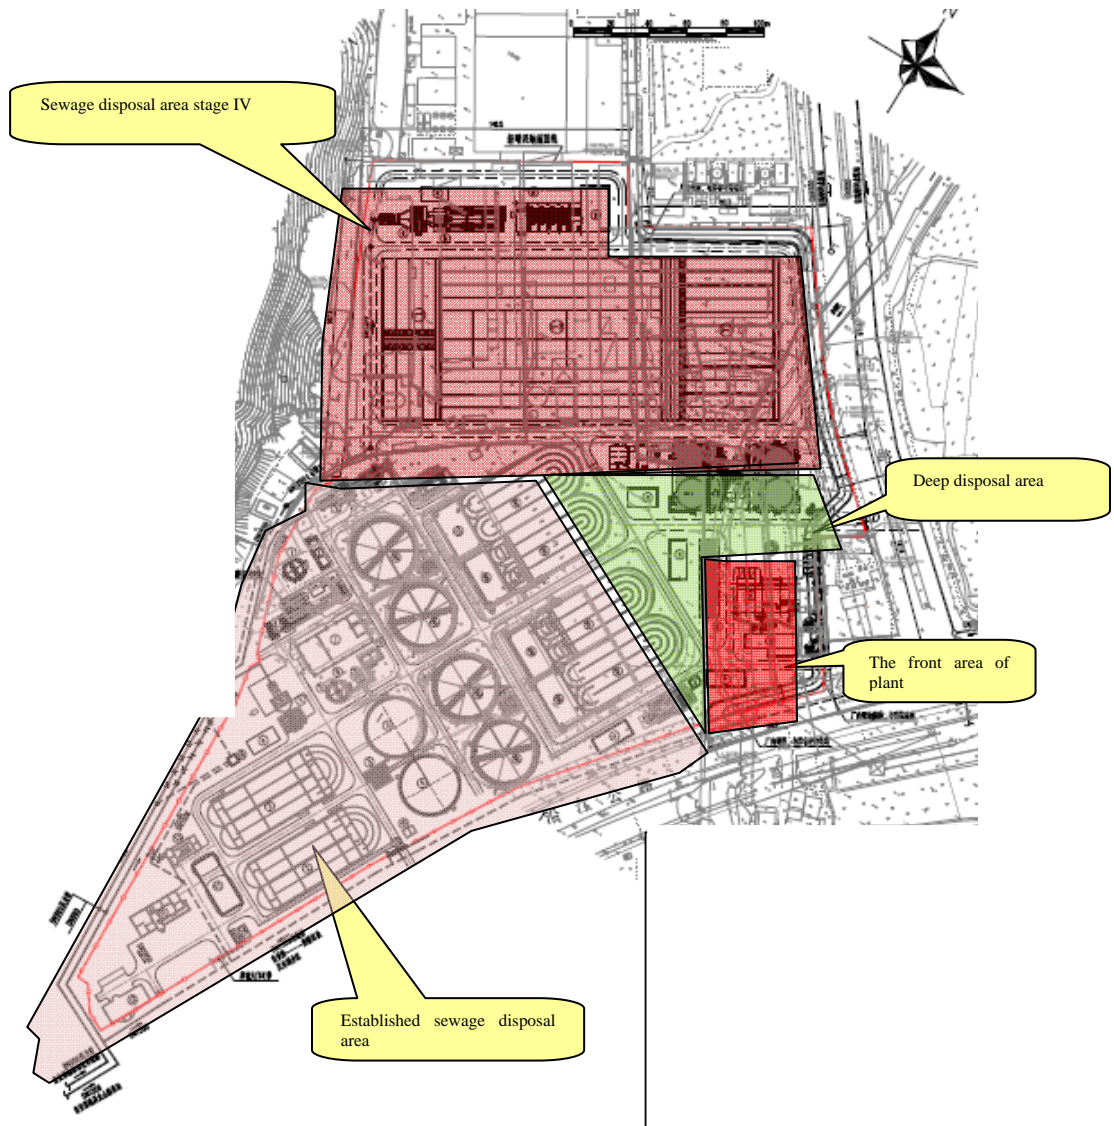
General Layout of Established Fuyang Sewage Disposal Plant and the Stage IV Project Plant Area
